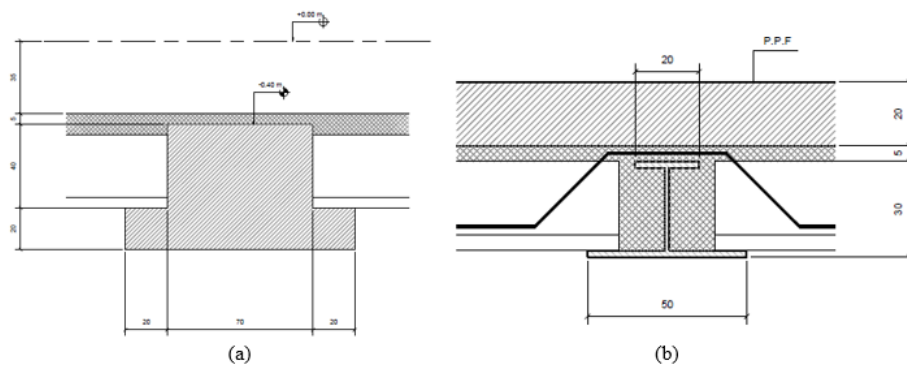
Schematic detail of connection between prestressed precast concrete beams and precast concrete slabs of underground level (a) and schematic detail of connection between steel beams and precast concrete slabs of upper floors (b).
